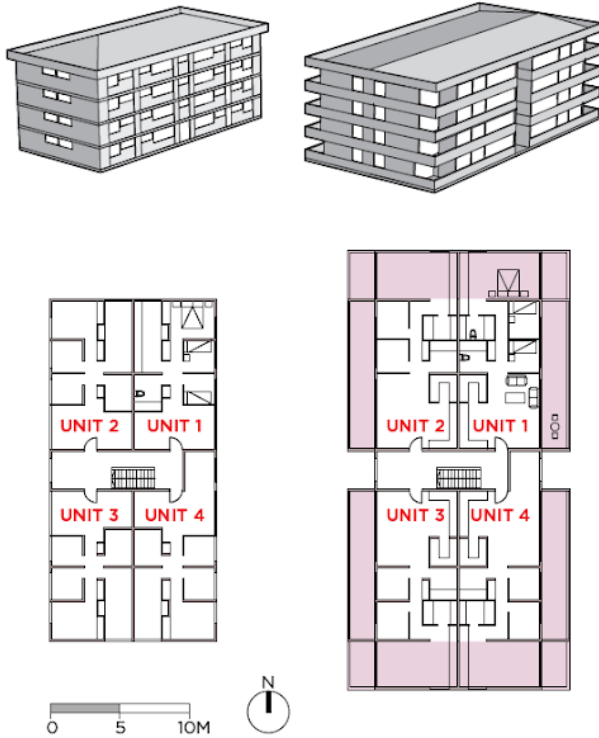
CORVI 1020 isometric view and typical floor plan of the original design (left) and the modified layout and expansion proposal (right, highlighted)
